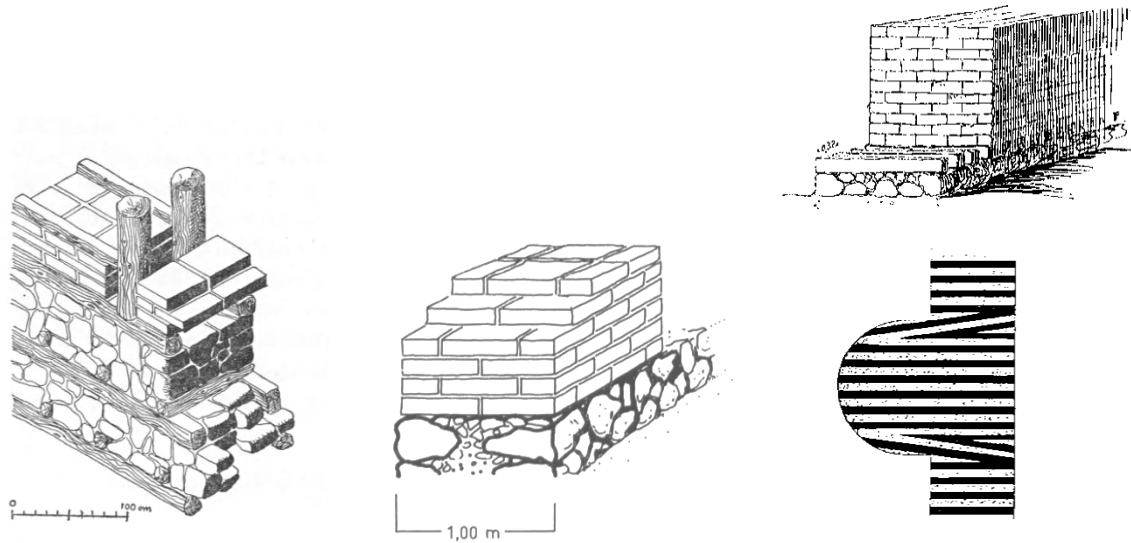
Beycesultan, Palace in Level V, courtyard I, detail from the courtyard wall [3] (a; left); Boğazköy/Hattusha, building in Level II with mudbrick masonry directly placed on the stone footing [4] (b; center); and Zincirli, mudbrick citadel wall on the stone wall of an earlier building separated with timber ribbing [5] (c; right).
